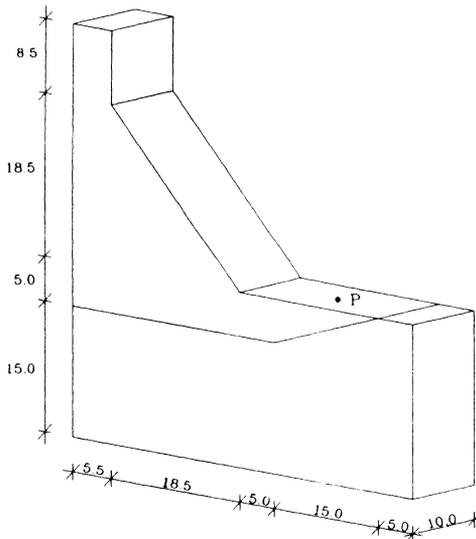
Scale model of gravity dam on jointed foundation. Dimensions in cm.
